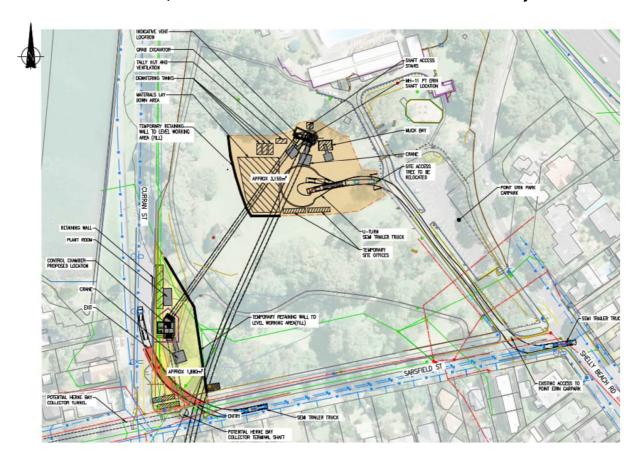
Proposed Point Erin Tunnel Alignment Plan.
